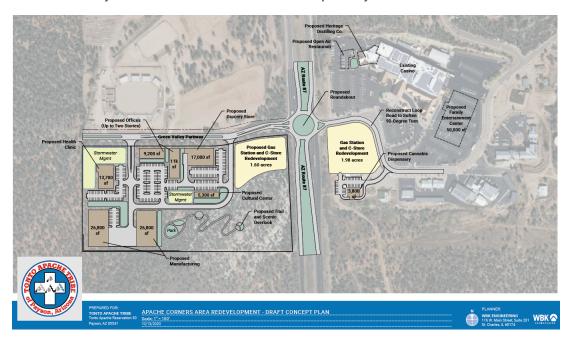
Draft Concept Plan of Apache Corners Area Development, by WBK Engineering
